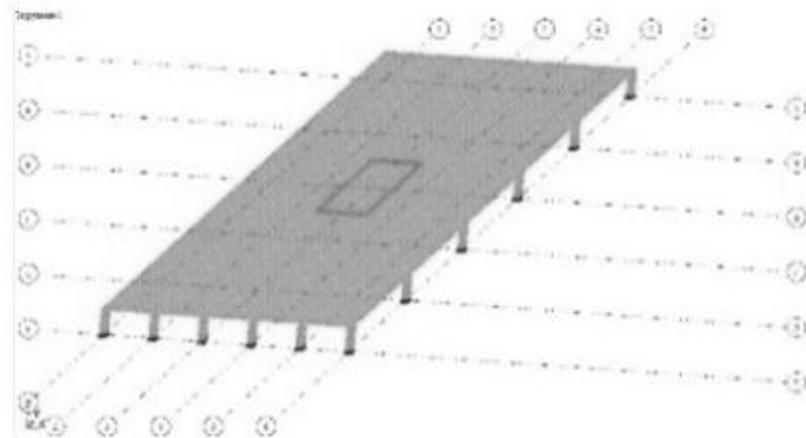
Scheme of a monolithic floor with rope-mounted reinforcement of the central cell
